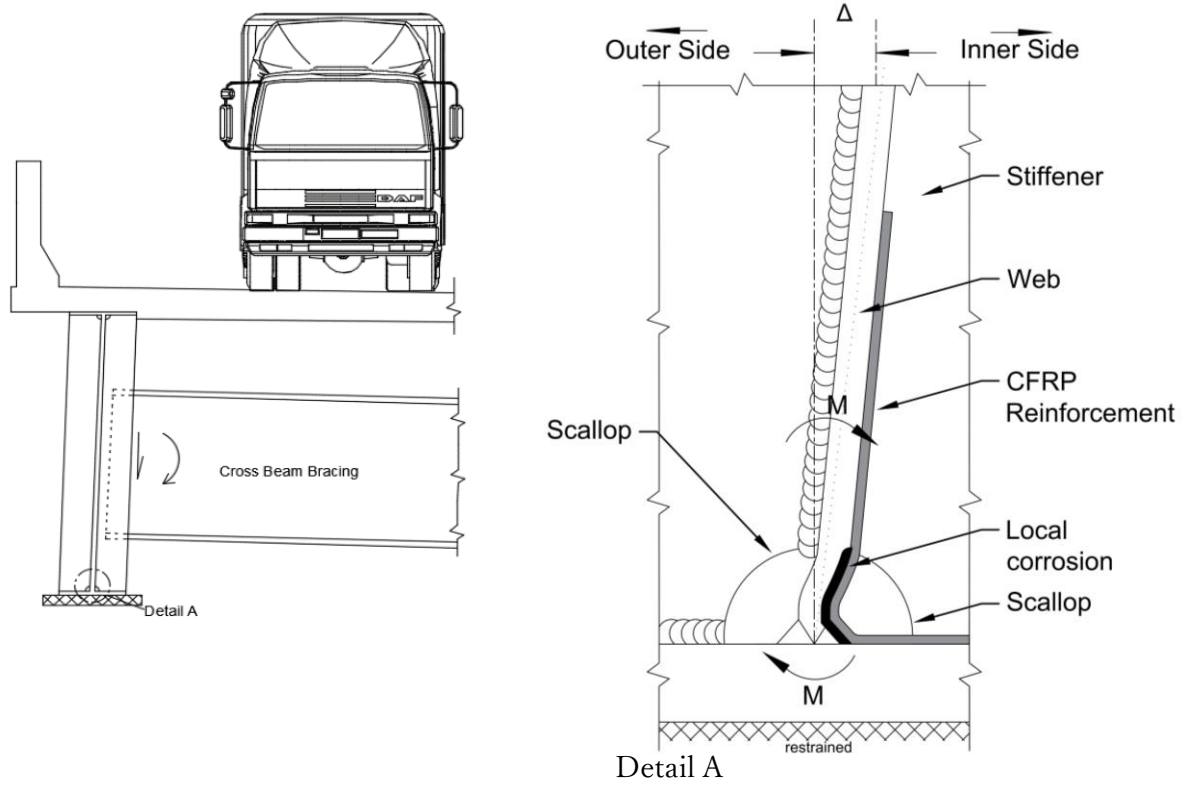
Schematic out-of-plane deformation in the CFRP retrofitted exterior girder web scallop at the girder end on the transverse stiffener plate.
